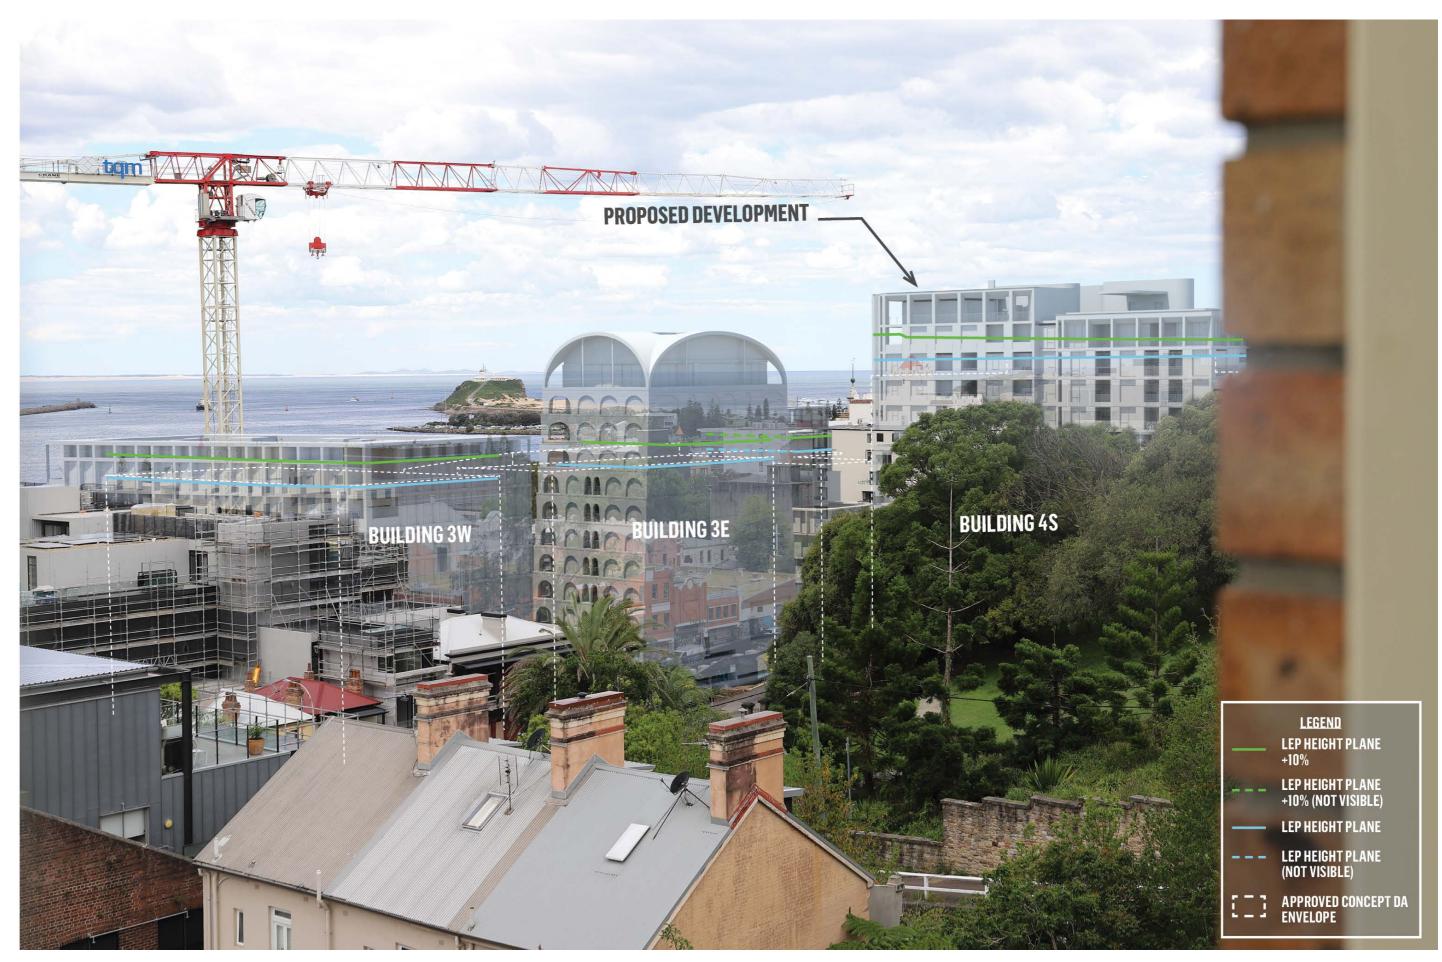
Proposed view from apartment 20 of the Segenhoe Building (study) view north-east.
